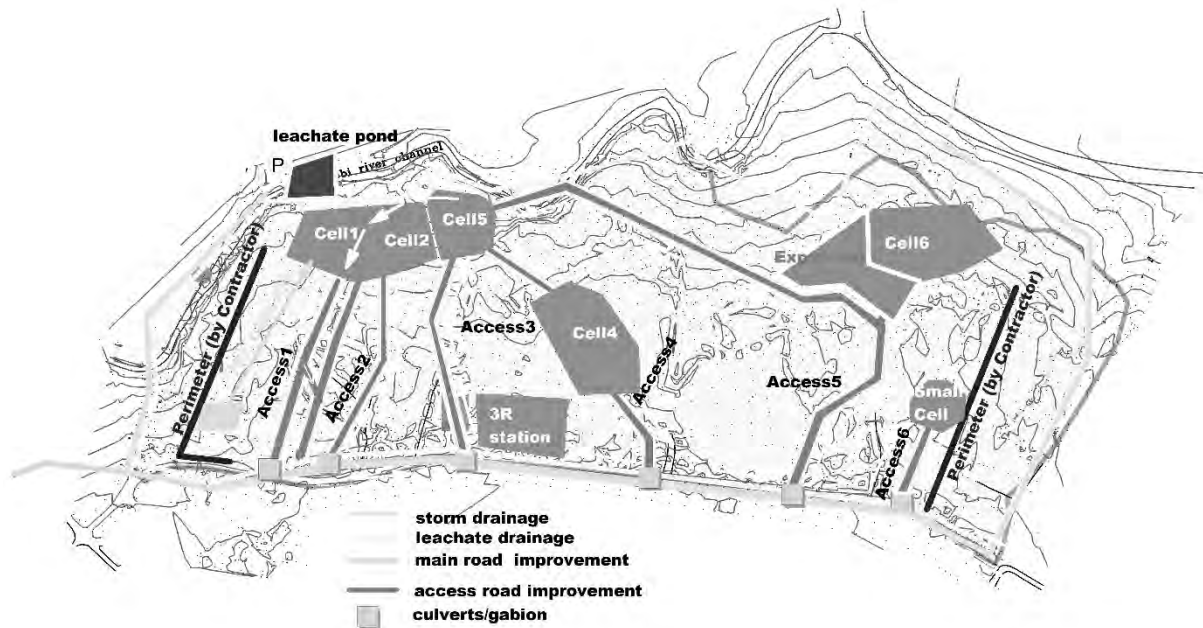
Layout Plan of Dandora Dumpsite in Phase 5
